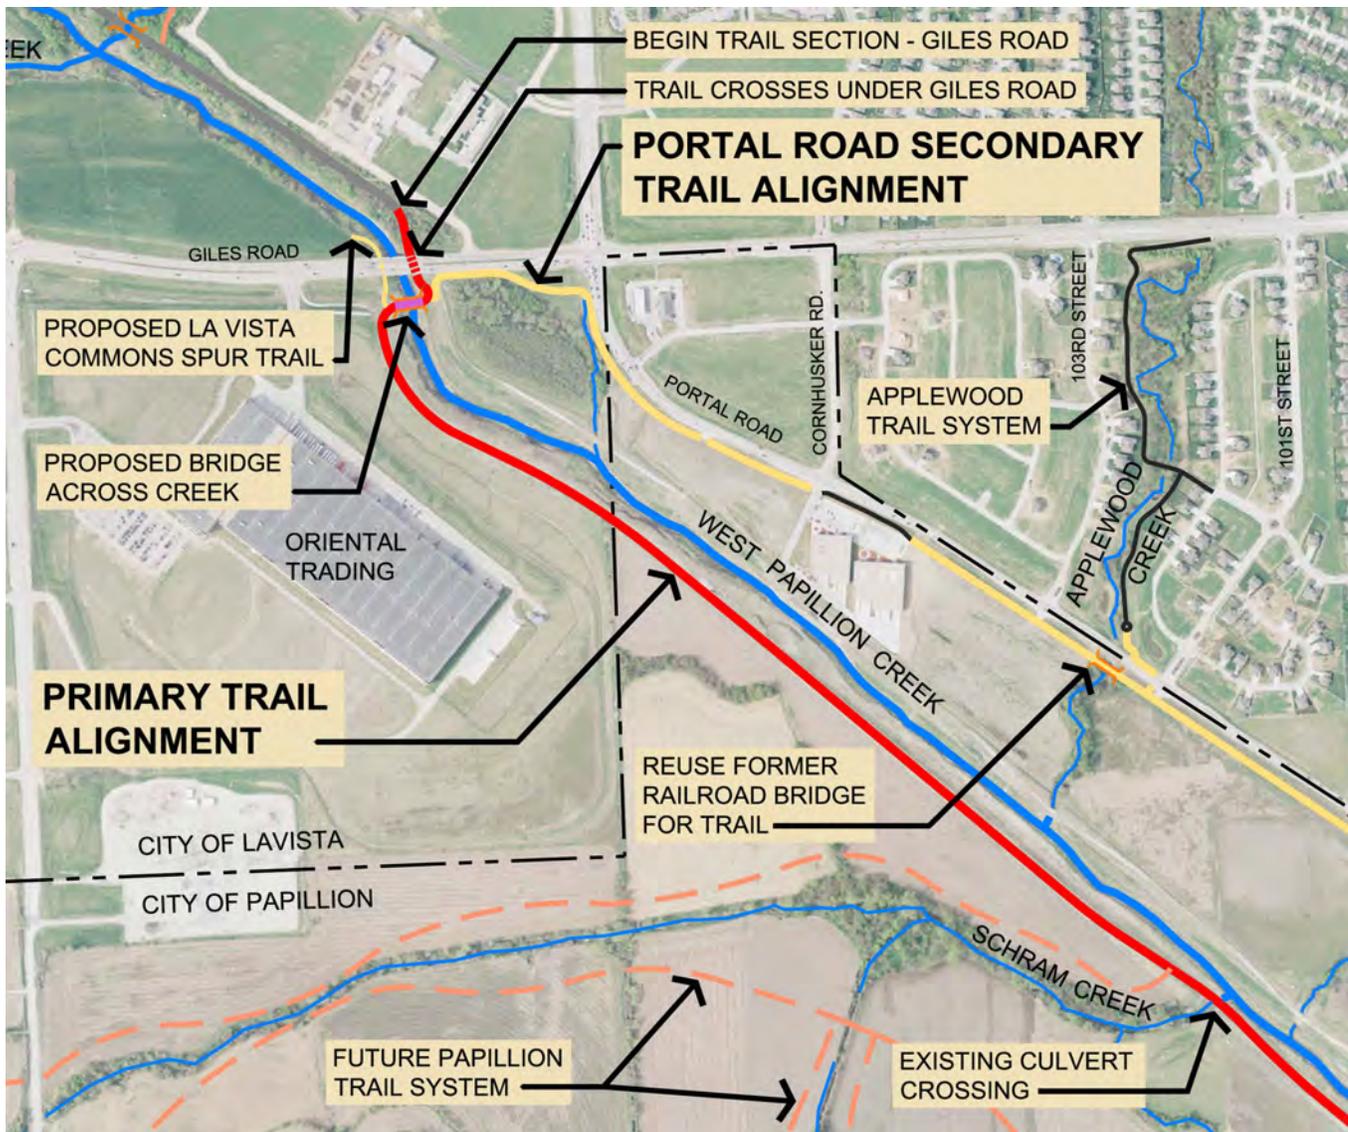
Giles Road to Harrison Street - Giles Road to 101st Street segment, Primary and Secondary Trail Alignments
